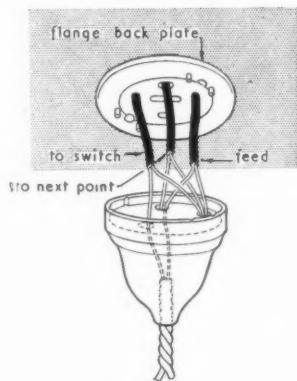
(left). Diagram showing flanged back plate. Fig. 13. (above). Skirted lampholder.
